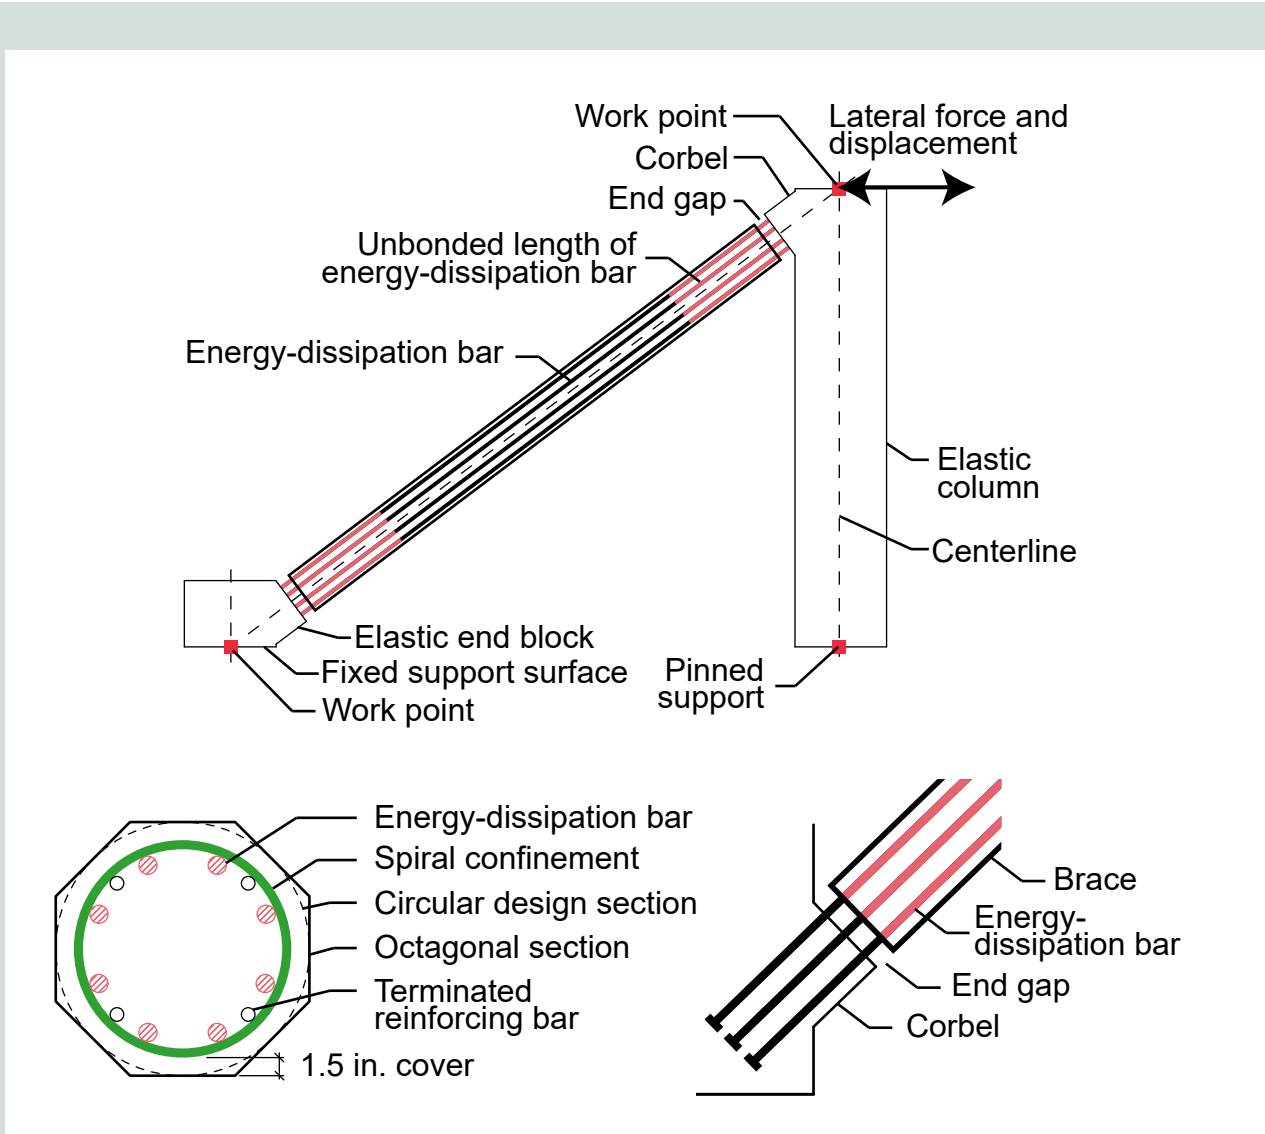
Isolated reinforced-concrete buckling-restrained brace subassembly, section view of brace, and brace-to-frame connection at end gap. Note: 1 in. = 25.4 mm.
